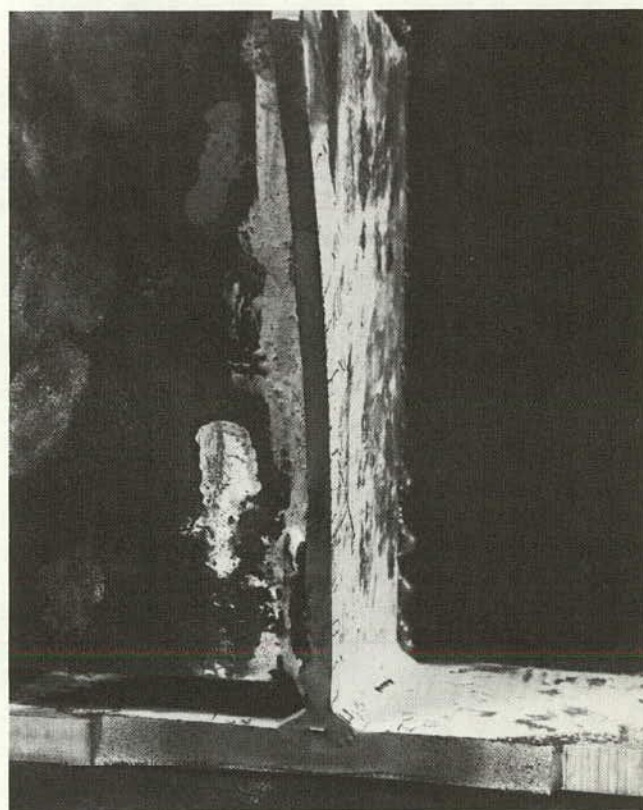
Typical fatigue crack surface at Type 1 stiffener at failure.
